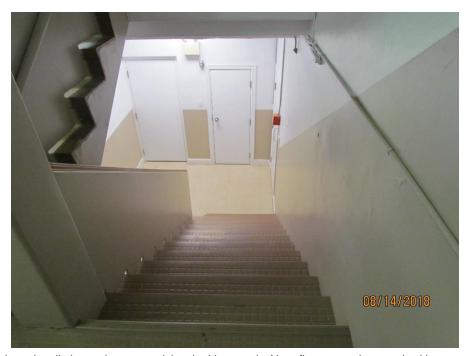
Legion Hall view looking south. Note step up to west basement (door at south west corner).
